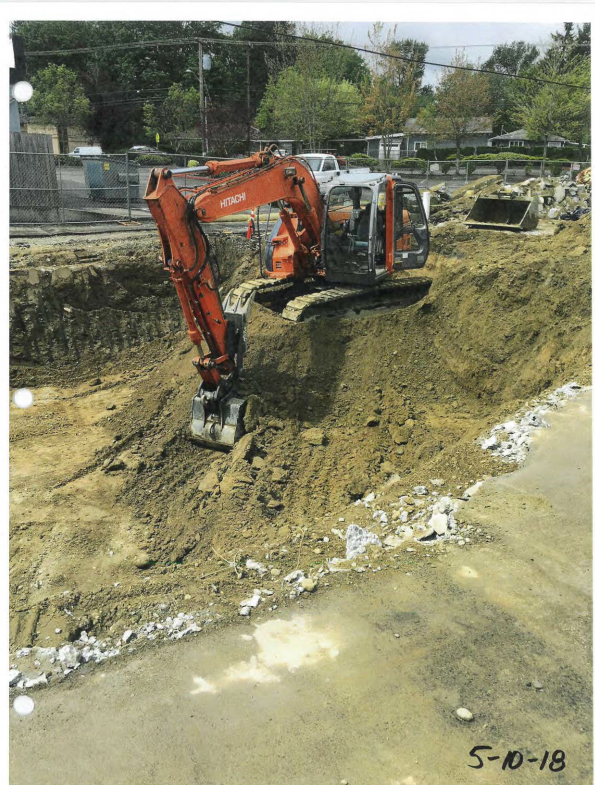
May 10, 2018. Excavating soil at Building C to 9 feet bgs. View NW
